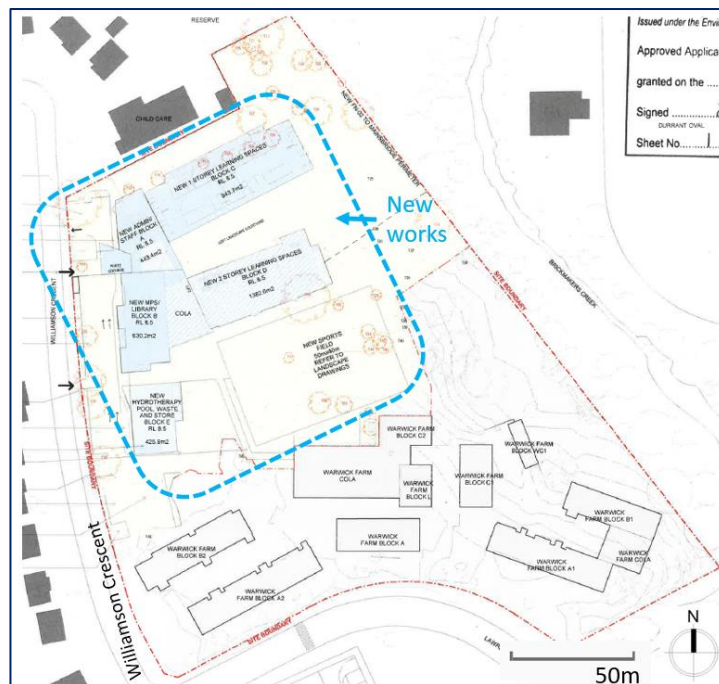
| Approved site layout (Base Source: Department's approved plans 2019)
